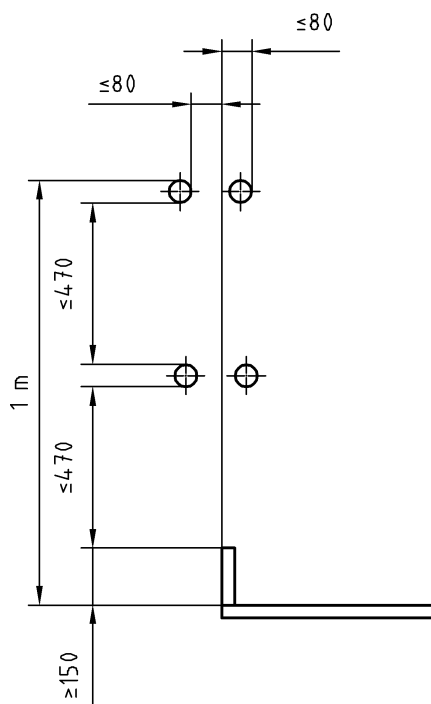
Dimensions for vertical side protection with one intermediate guardrail
